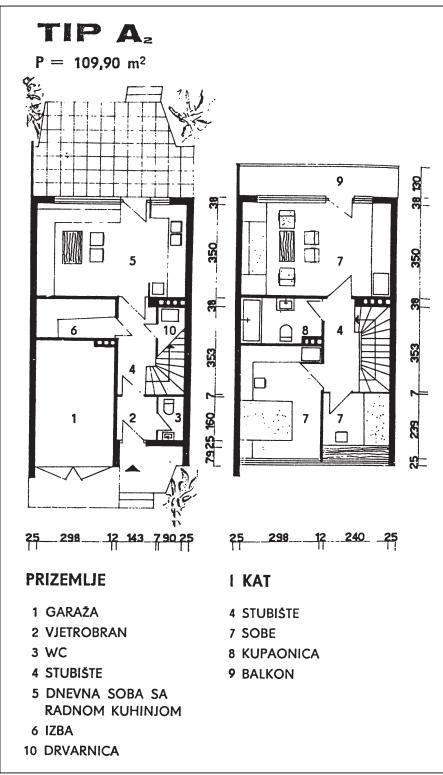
TRSTIK – GROUND-FLOOR AND FIRST-FLOOR PLANS OF THE SINGLE-FAMILY ROW HOUSE, TYPE A₂
